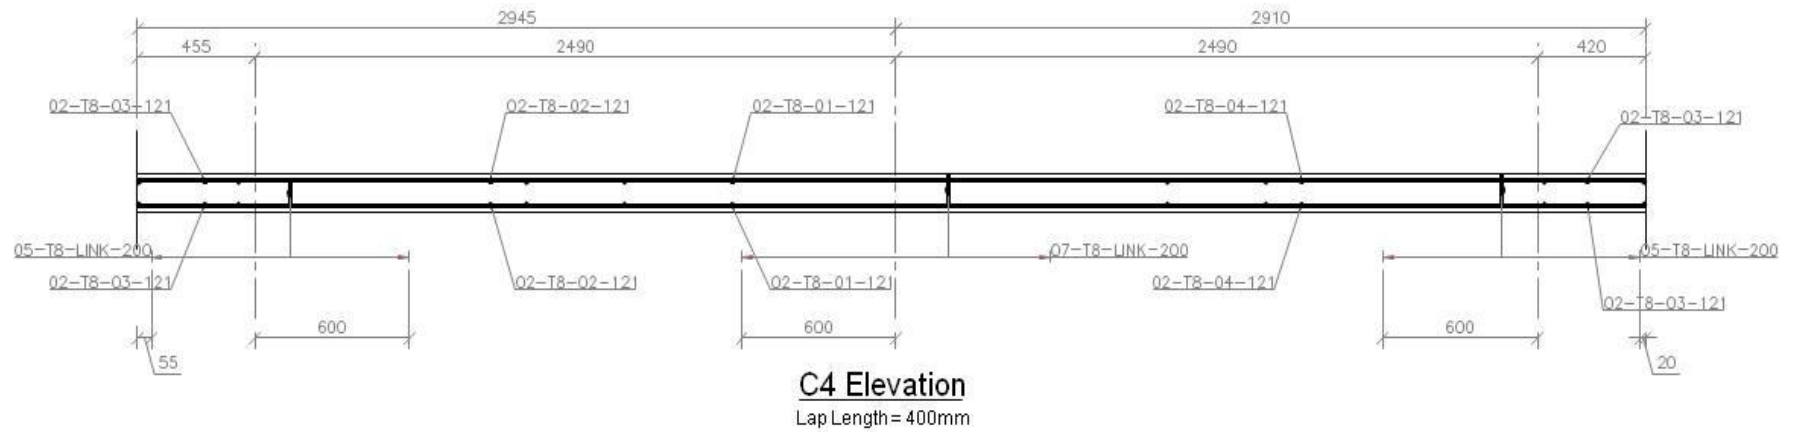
Elevation of reinforcement detailing of sample C4.
